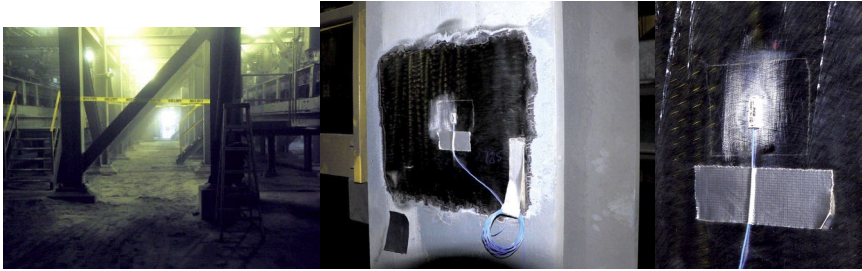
Test environment, columns to be instrumented and piezoelectric gauge mounted to building column flange at web centerline
